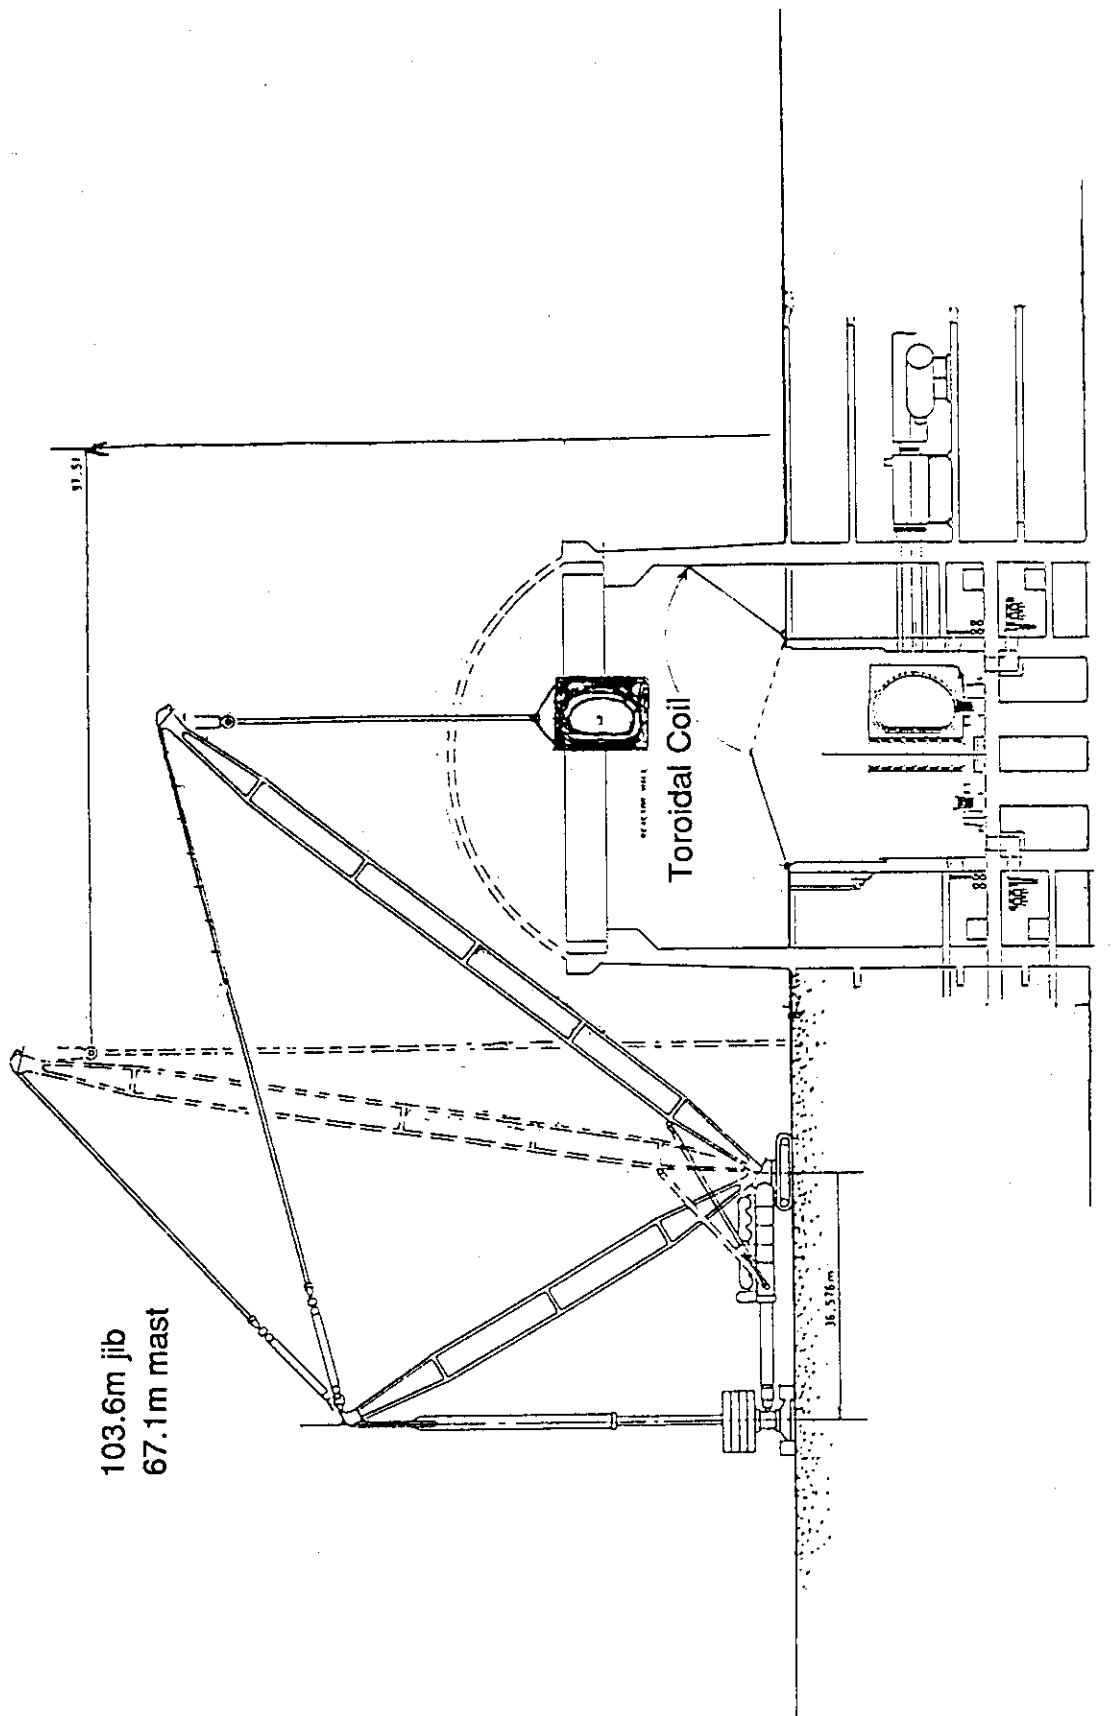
Initial assembly of TF coil using mobile crawler crane.
